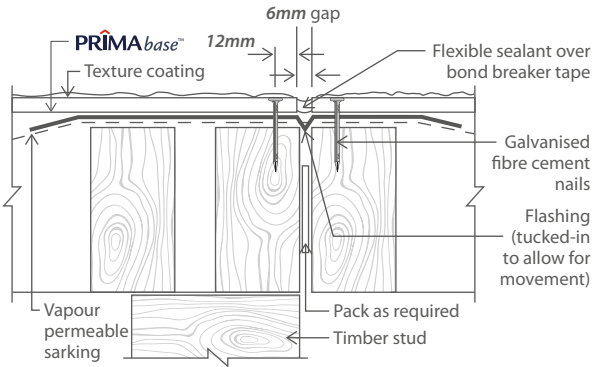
Vertical Movement Joints - Intersection with Clad Wall
